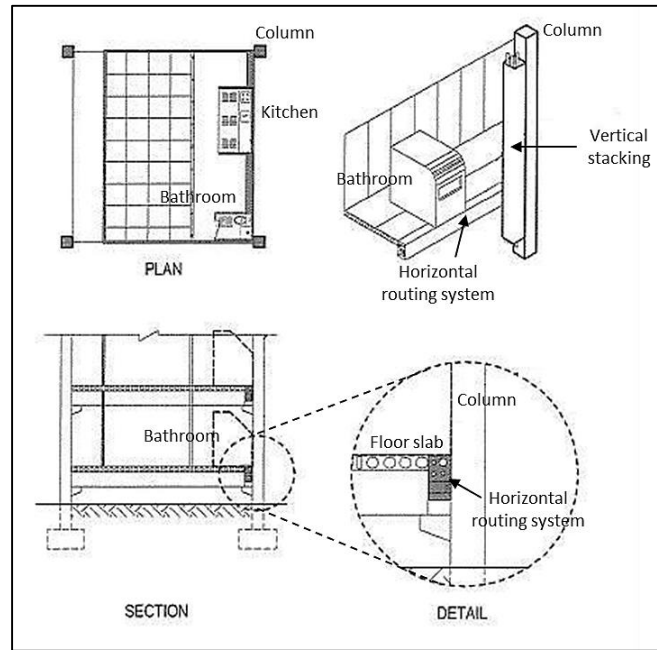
Configuration of building structure installed with the prefabricated integrated service panels
